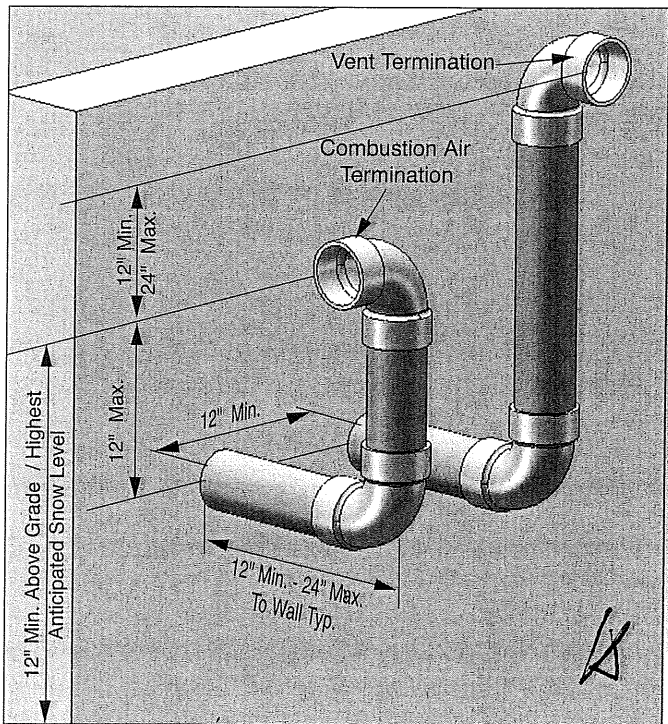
Direct Vent - Sidewall Snorkel Termination of Vent and Combustion Air Piping
